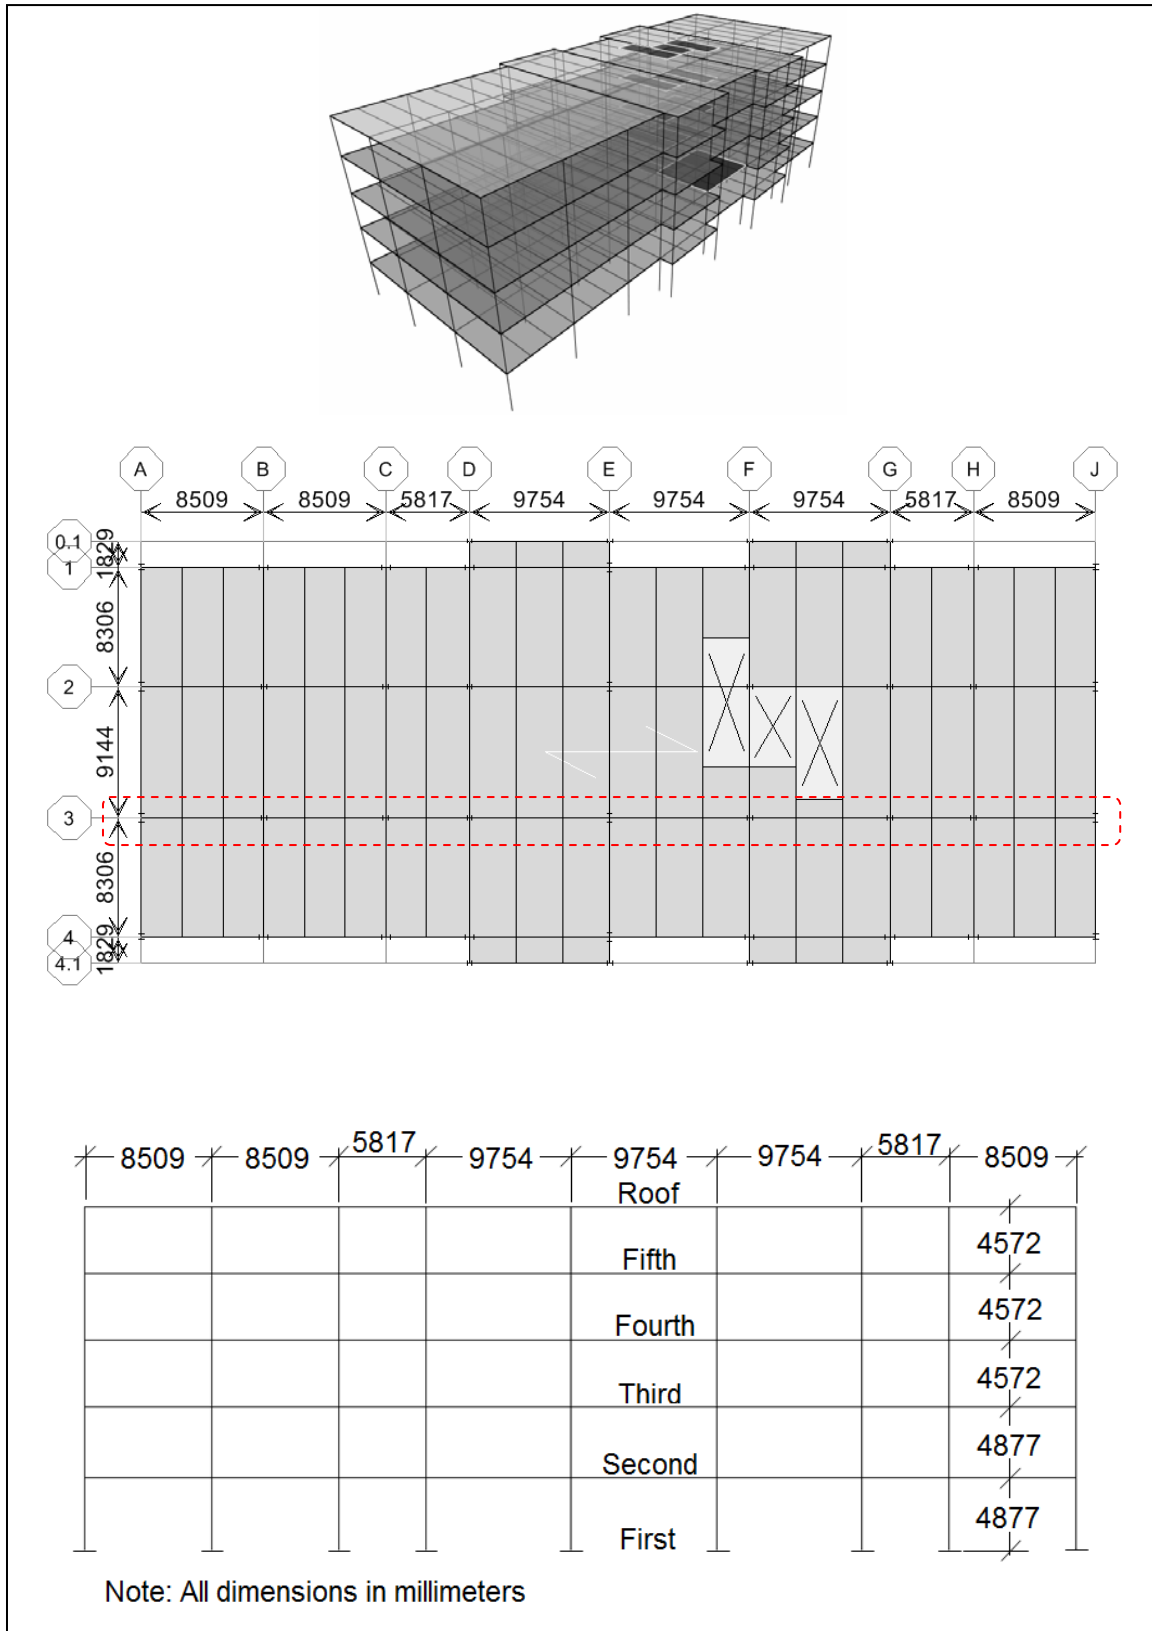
Building MF-1 3D, Plan and Section at Gridline 3
